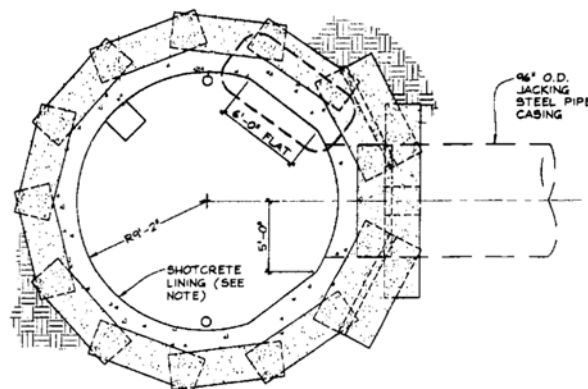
Interlocking Panels Form Shaft and Treated Zone at Receiving Shaft Break-in
